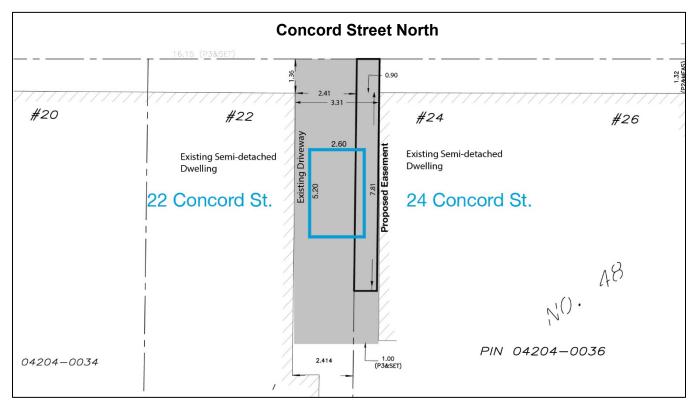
Plan showing dimensions of the Parking Space (blue) and Existing Driveway
